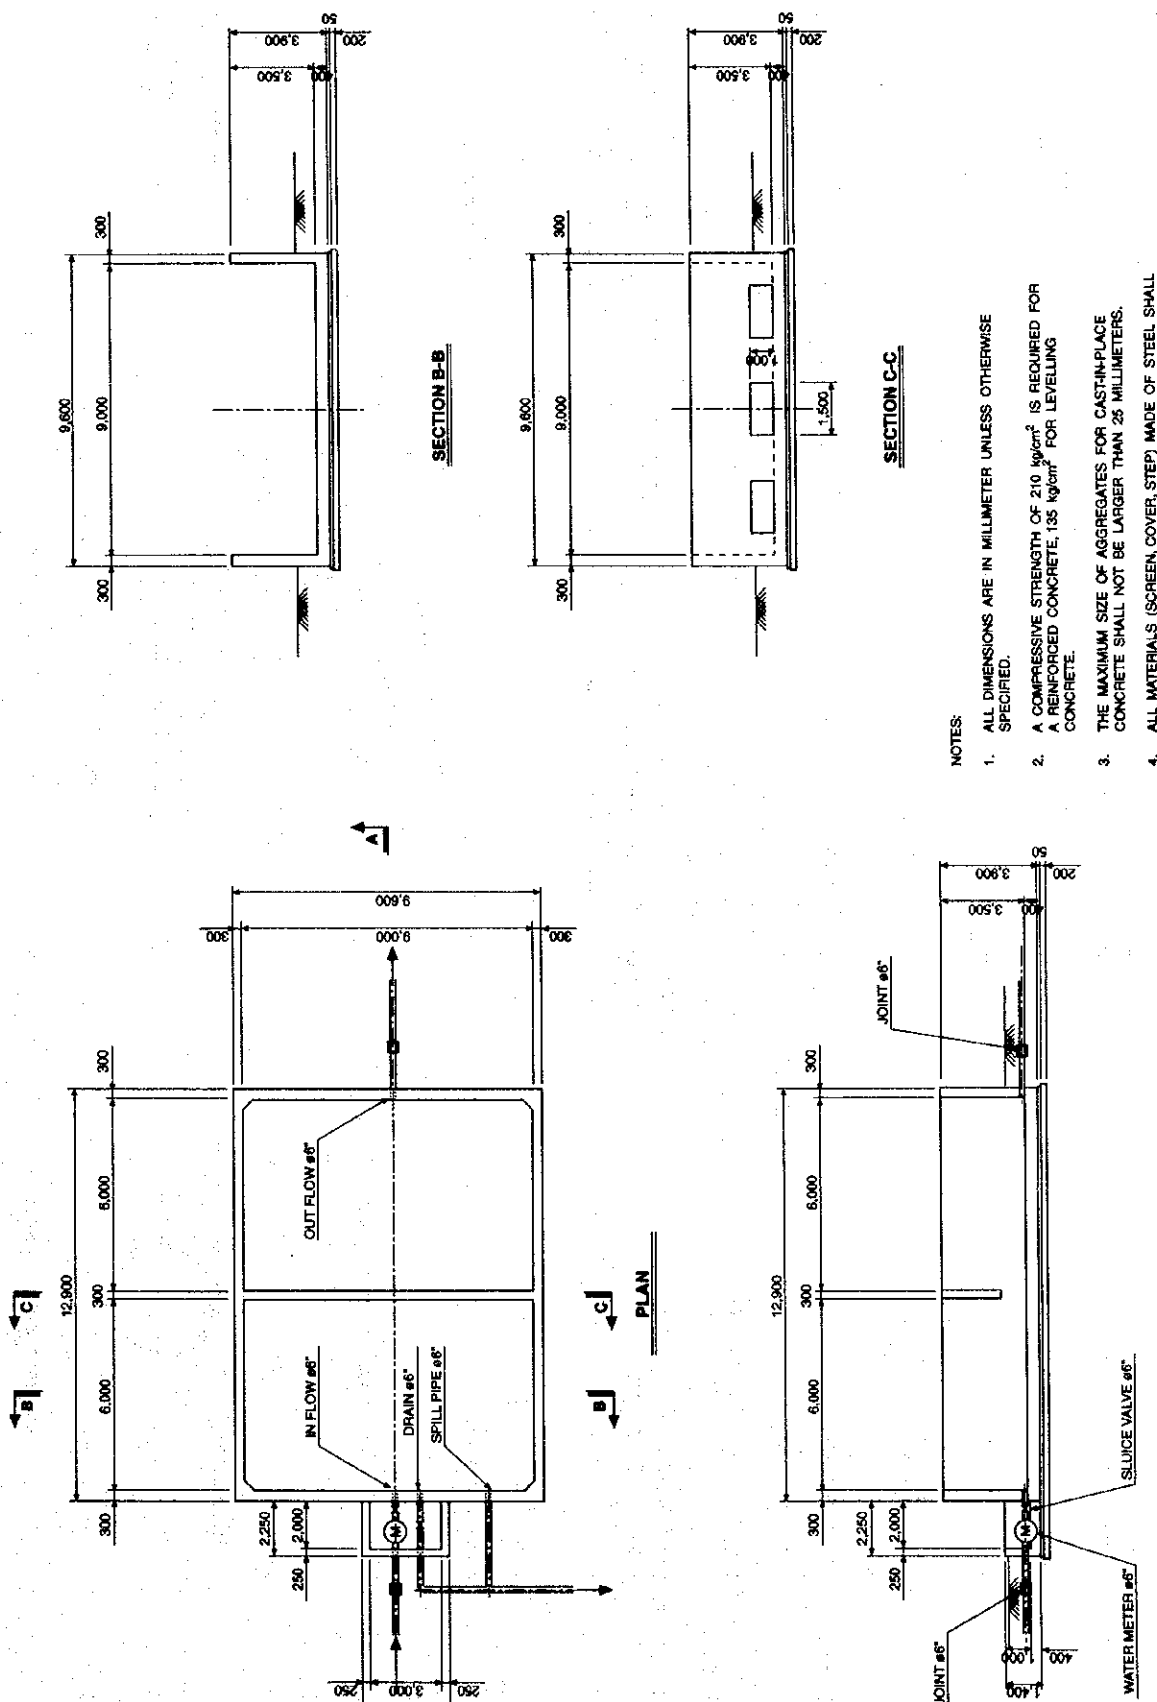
Plan of Intake Work (Water Cushion Intake Type)
